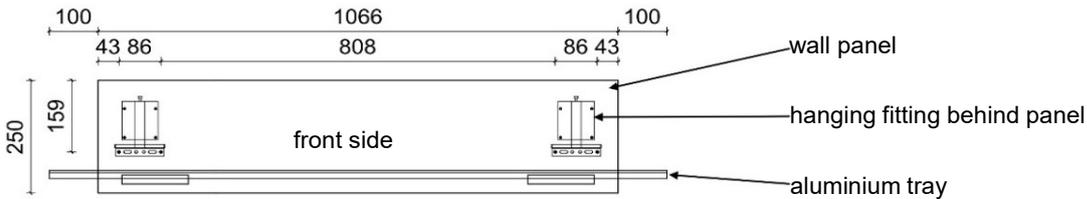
Drilling dimensions (in mm) from outer edge for suspension rail
